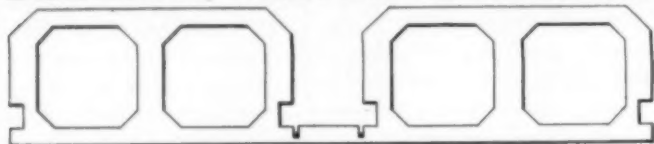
Hollow Precast Floor Tile Made From Gypsum
